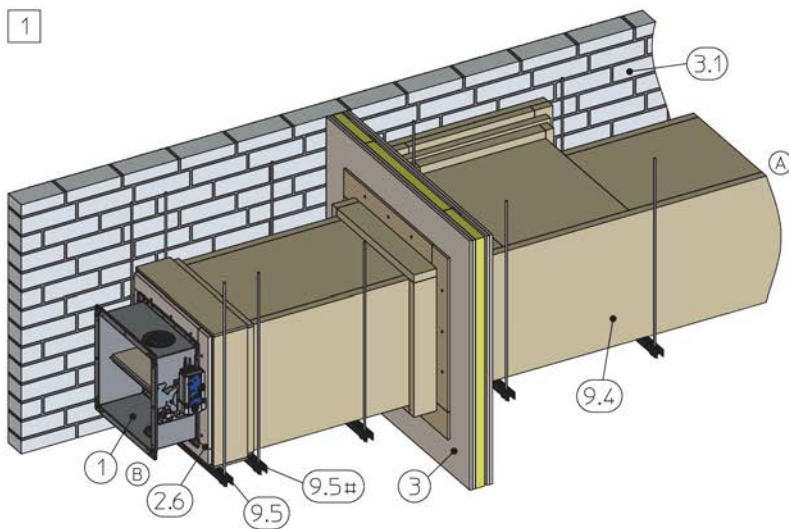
Dry mortarless installation remote from solid walls with installation kit WE (wall-mounting type)
